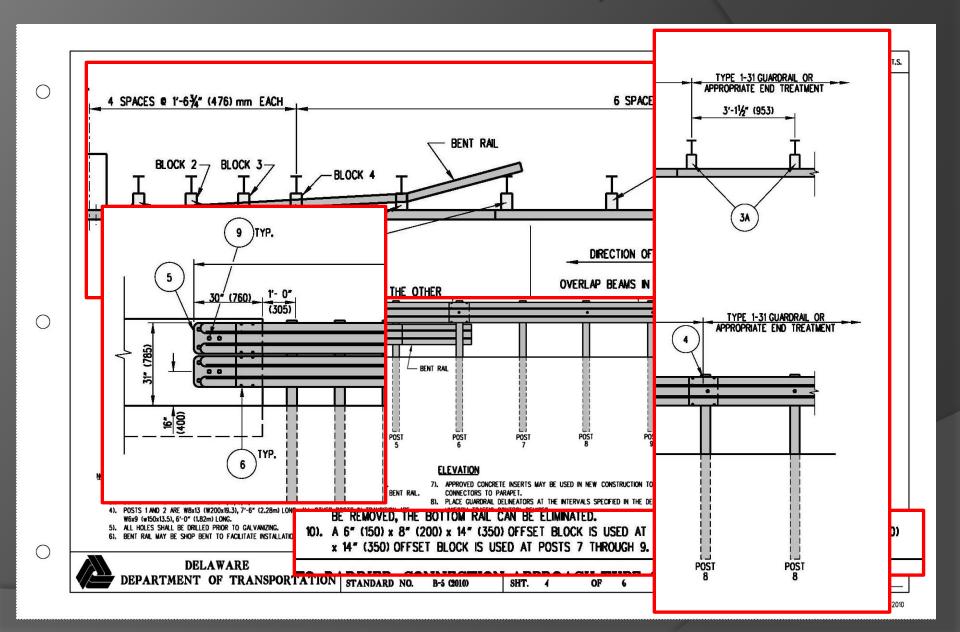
, SHEET 2 OF 6 GUARDRAIL TO BARRIER CONNECTION, TYPE 1 HARDWARE
